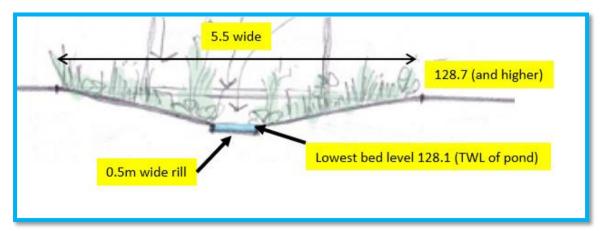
Landscape Architect's section through swale/rill providing low-flow channel at a fall.
